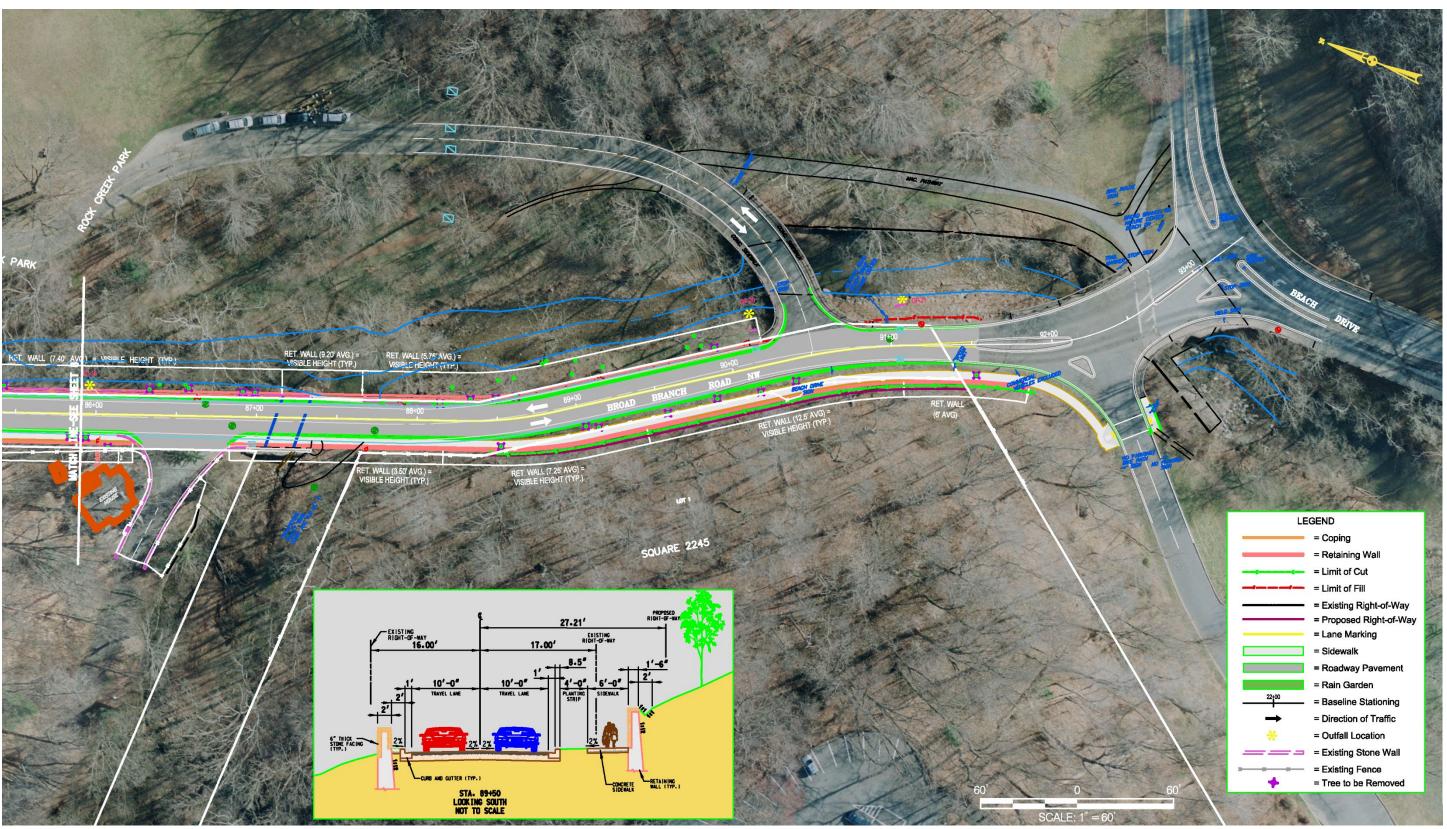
Alternative 3 Modified (Sheet 9 of 9)
